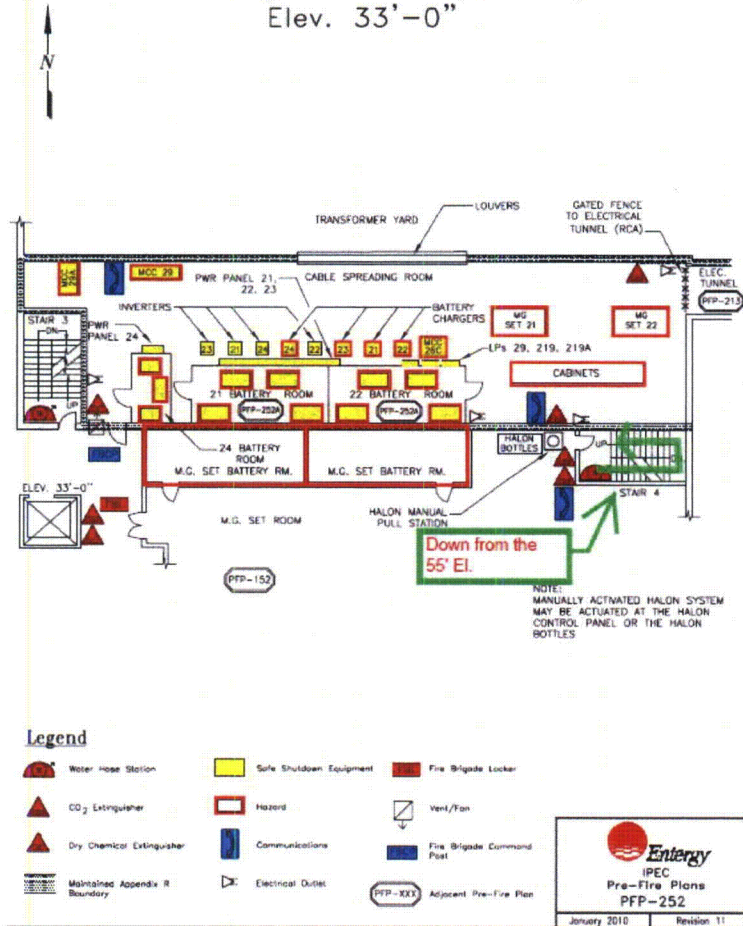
Unit 2 Secondary Cable Routing at 33' (Reference 9-m)
